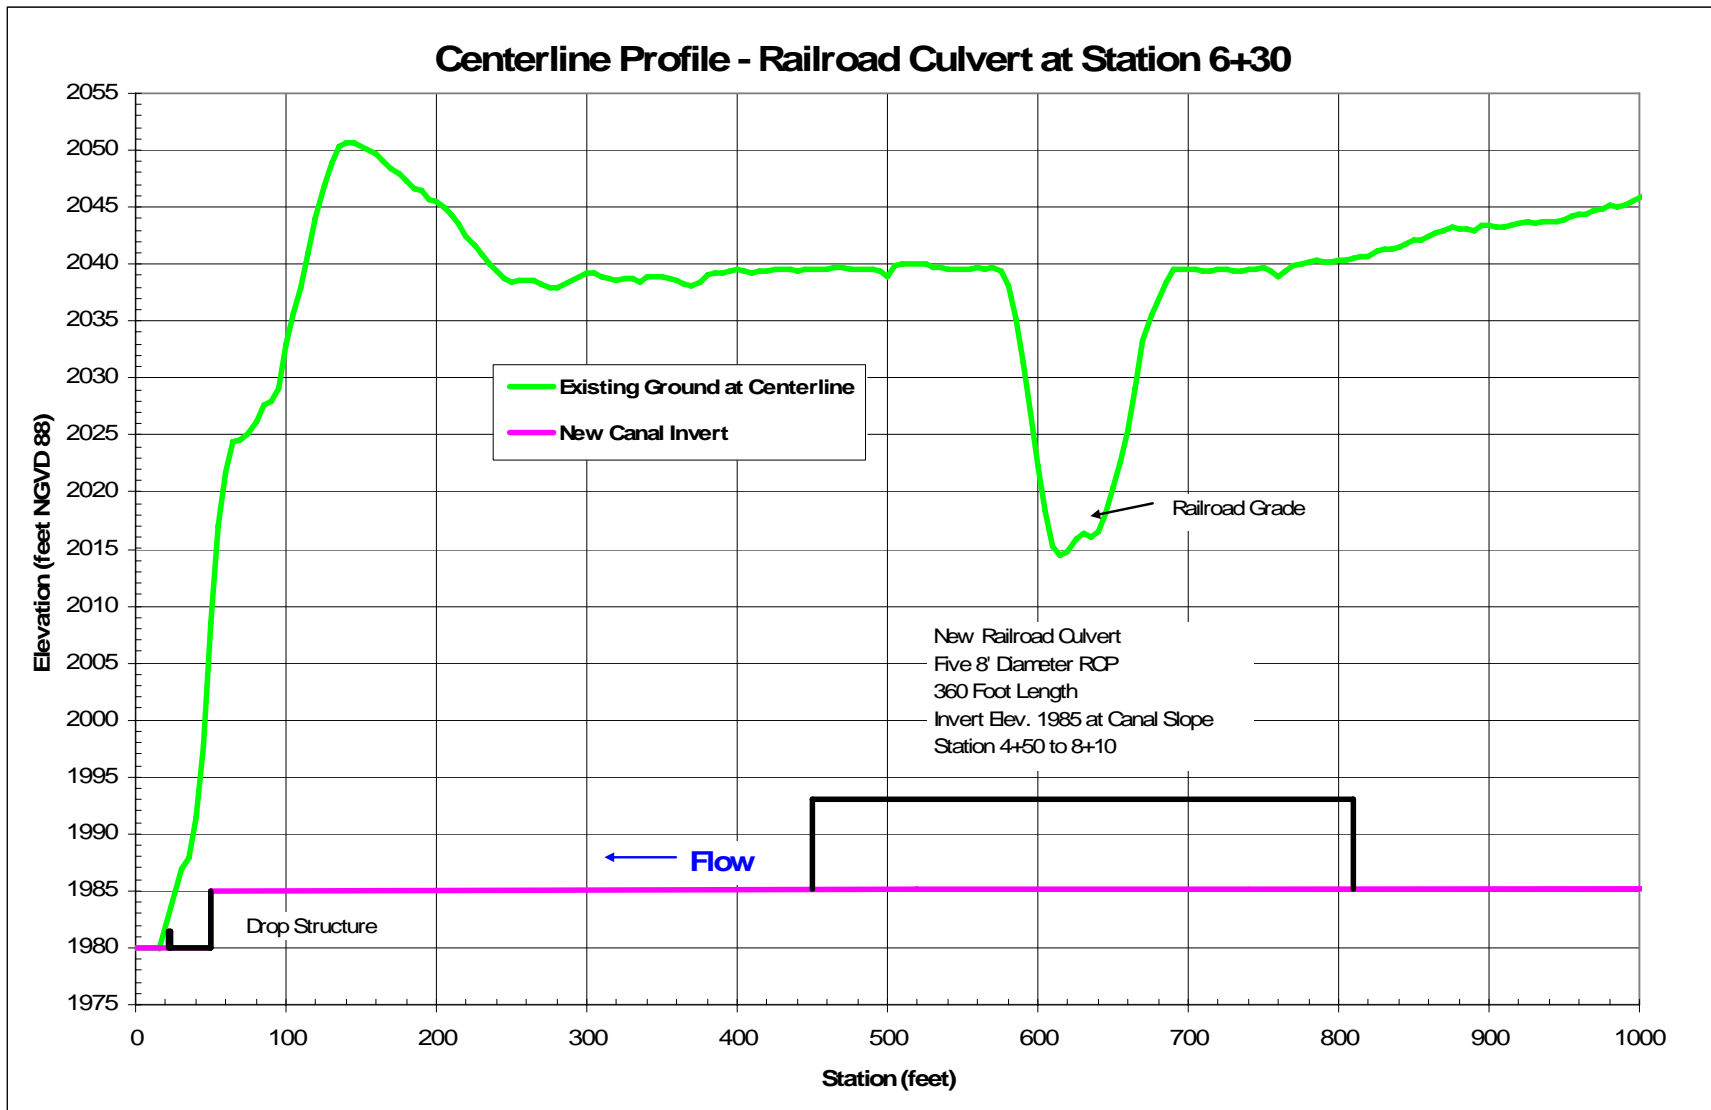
Centerline Profile – Railroad Culvert at Station 6+30
